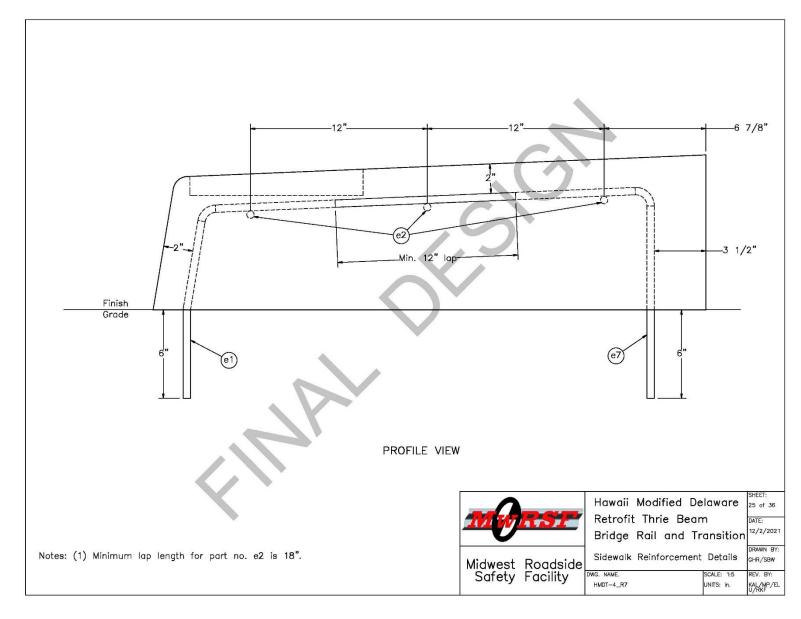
Sidewalk Reinforcement Details, Test No. HMDT-4
